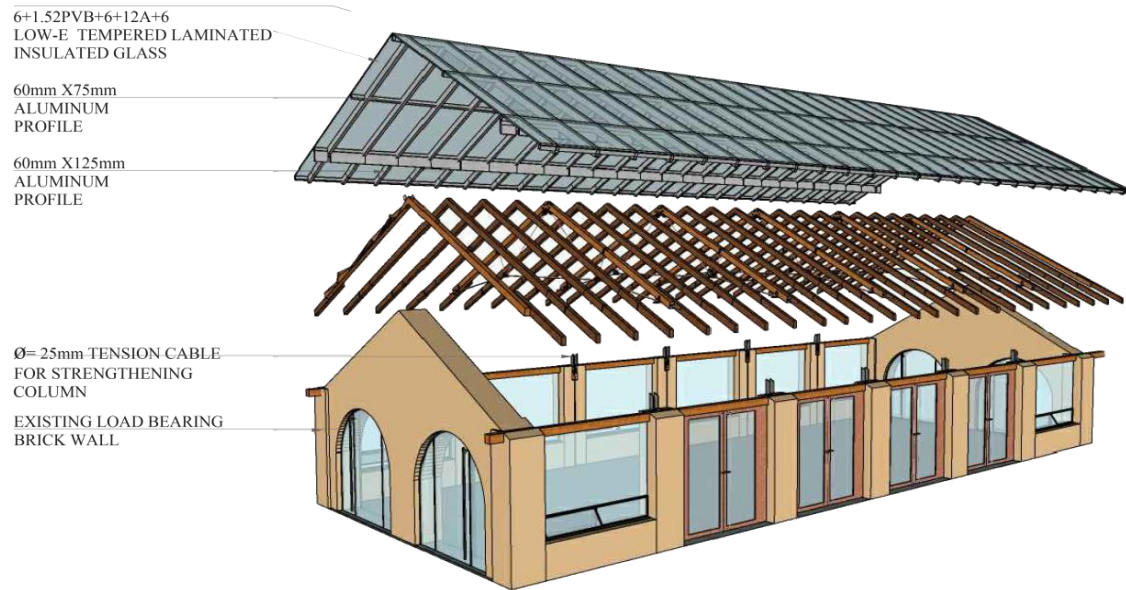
Exploded Axonometric View of Roof Detail for CC-05
